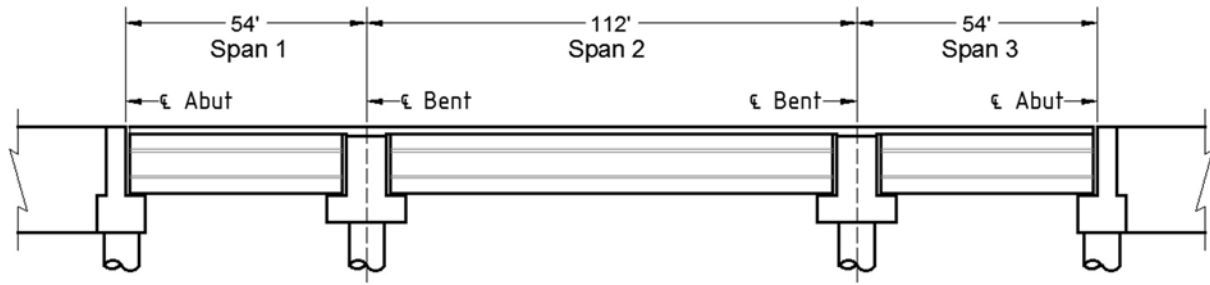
Spans of the Bridge with 30 Degree Skewed ITBC
